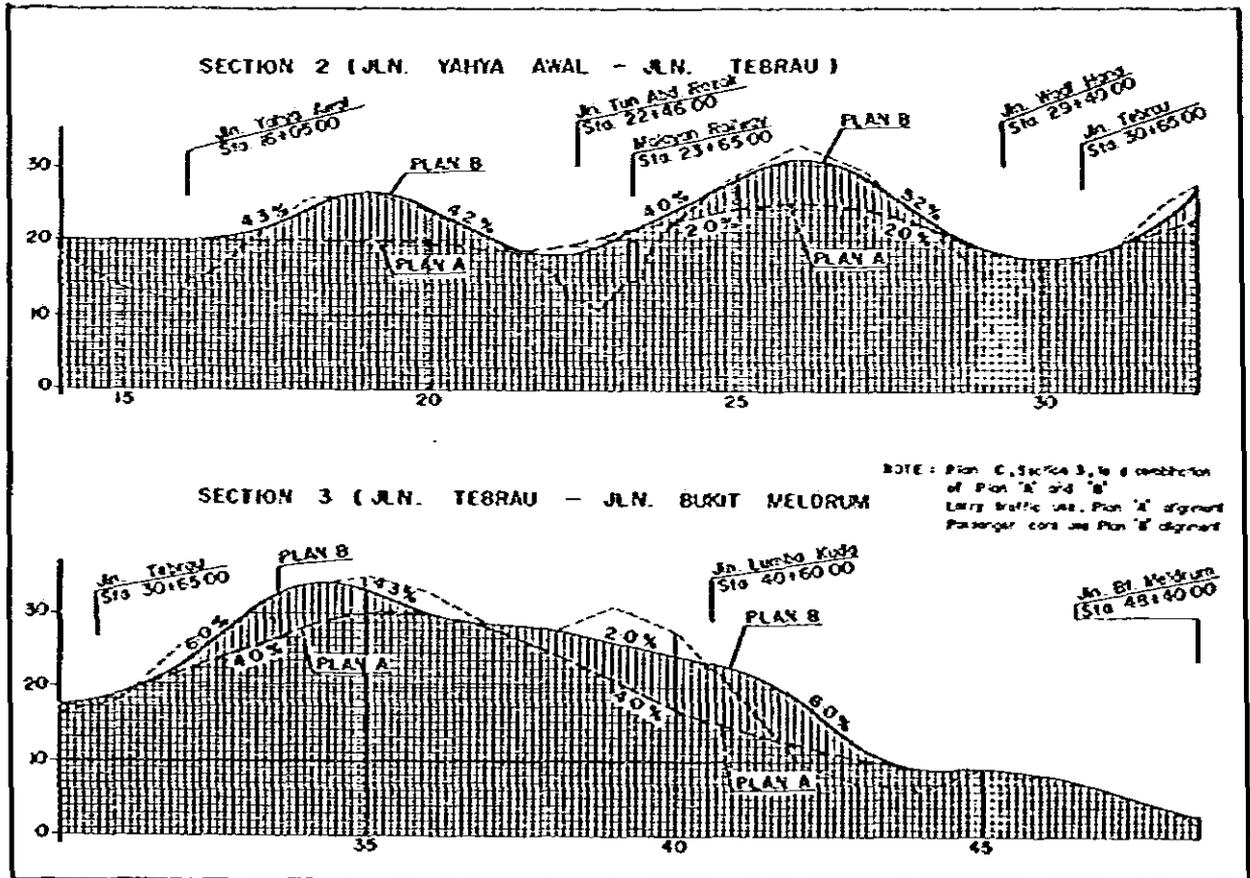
PROFILE OF SECTIONS 2 AND 3
